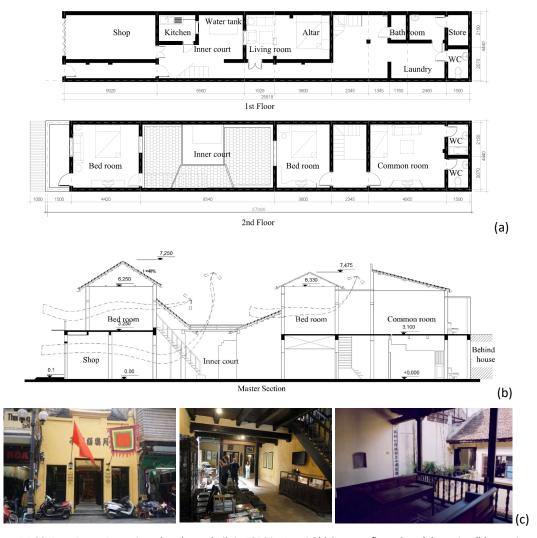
38 Hang Dao – An ancient shop-house built in 1856 in Hanoi Old Quarter: floor plans (a), section (b), exterior and interior (c) (Le, 2011)
